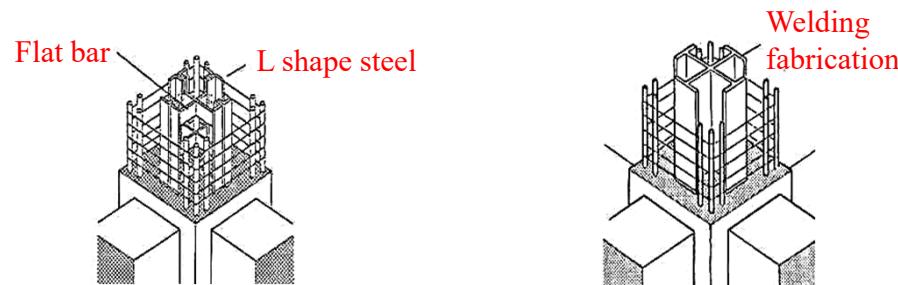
non-full web steel frame (grid-shaped) and full web steel frame
